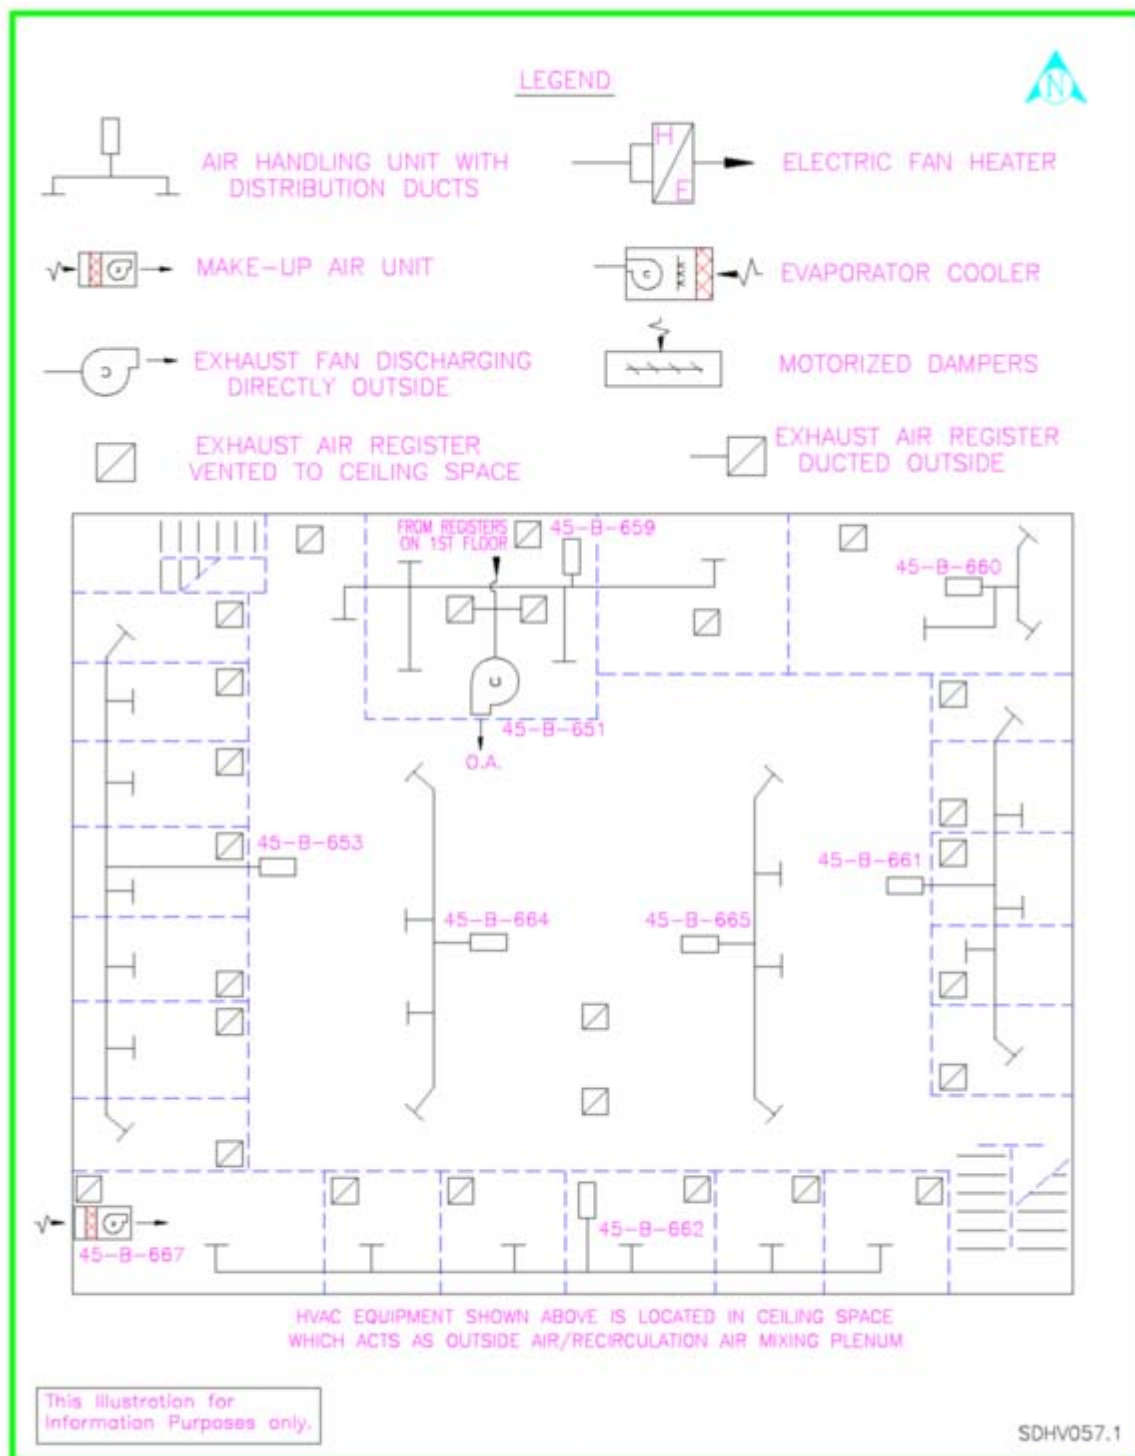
HV05 S&E Building Second Floor HVAC Block Diagram
